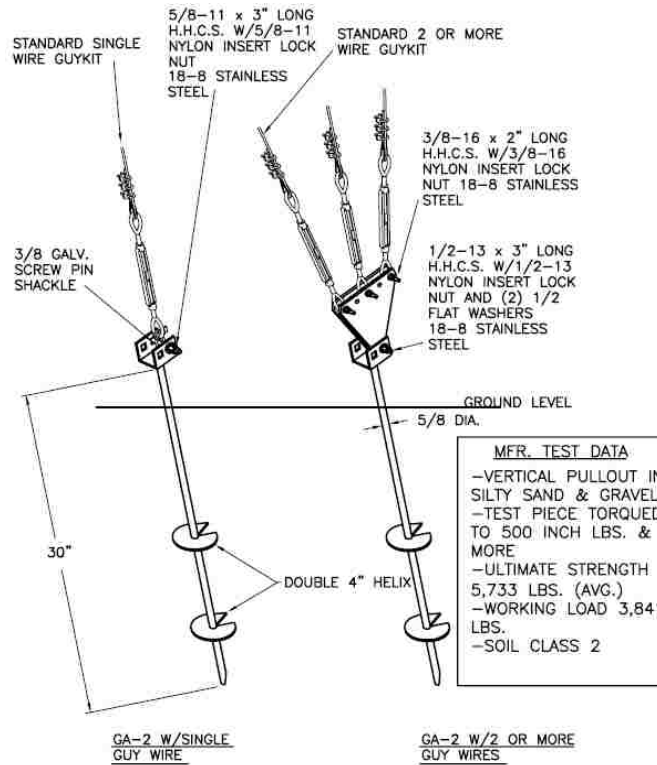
Manufacturer recommended subterranean anchor. (Aluma Tower Company, Inc 1997)
